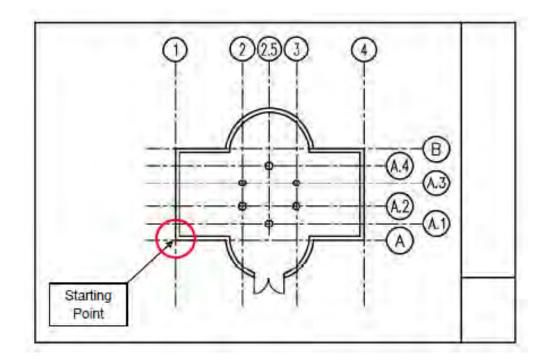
TAM PxP Section K: POG – Placement of Details, Sections or Elevations without Note Column
